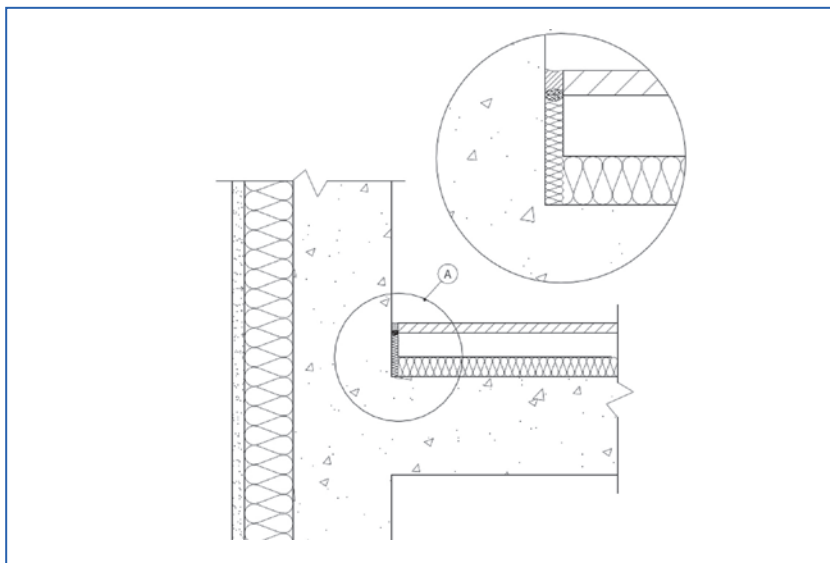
Detail showing a typical separating floor between dwellings. Class B in [5].
